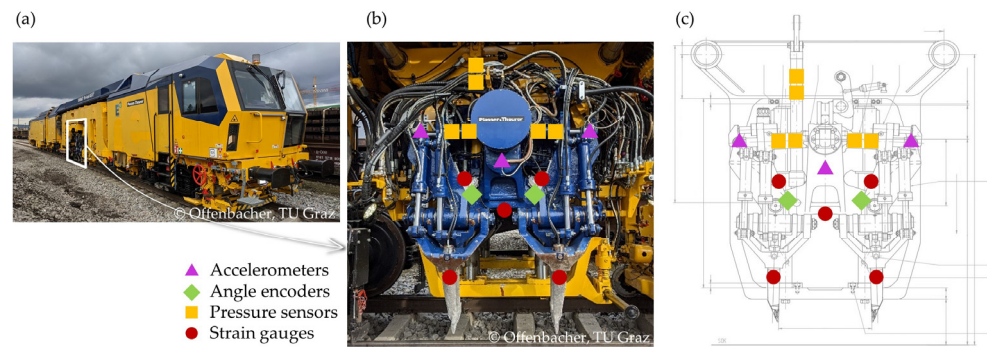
(a) Tamping machine Unimat 09-4x4/4S E³ and (b,c) measurement equipment installed on its four tamping unit segments.
